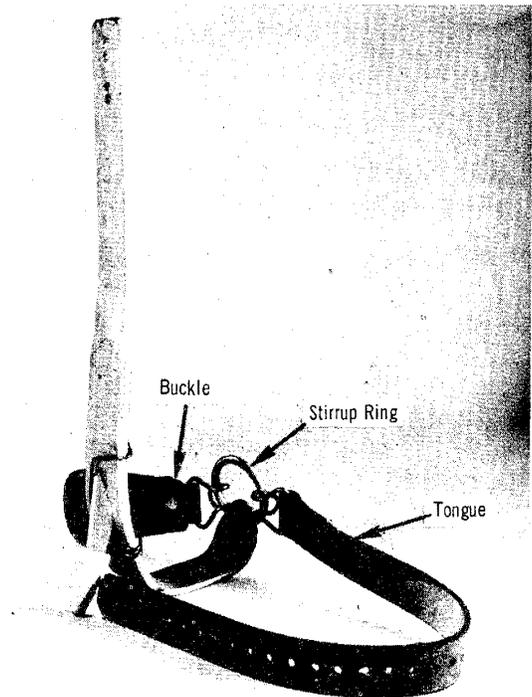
C Climber Foot Strap Installed on Right Climber
